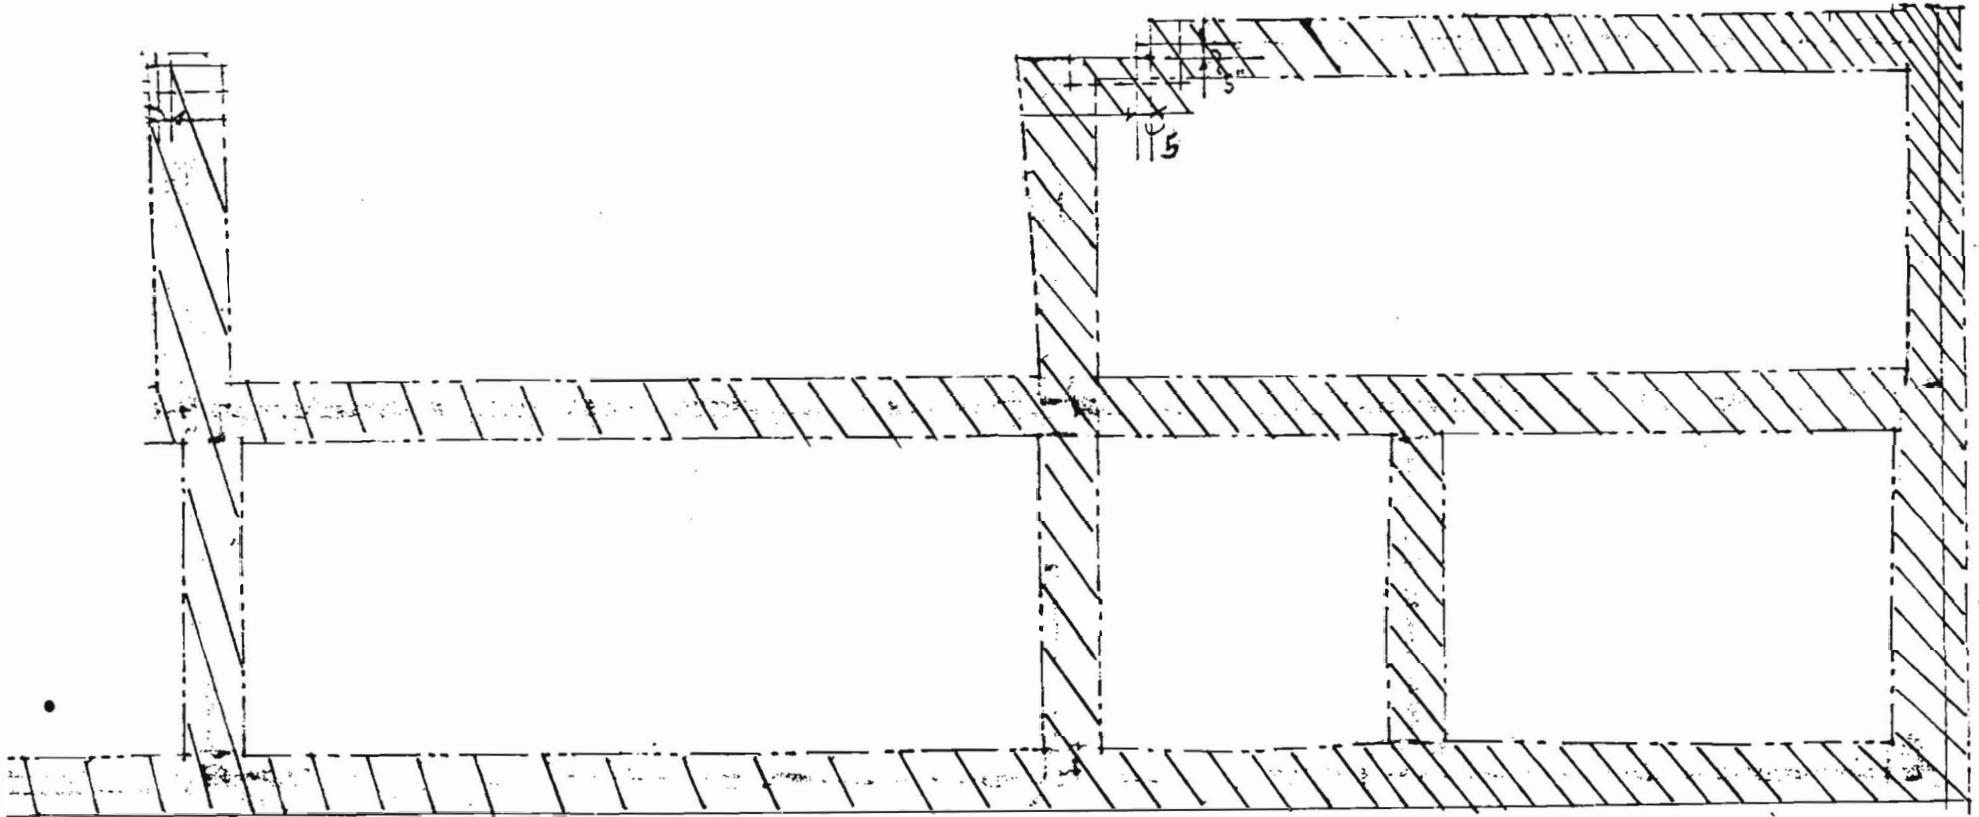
Existing Stone Foundation of the Spanish Governor's Palace located during reconstruction of the Site.
